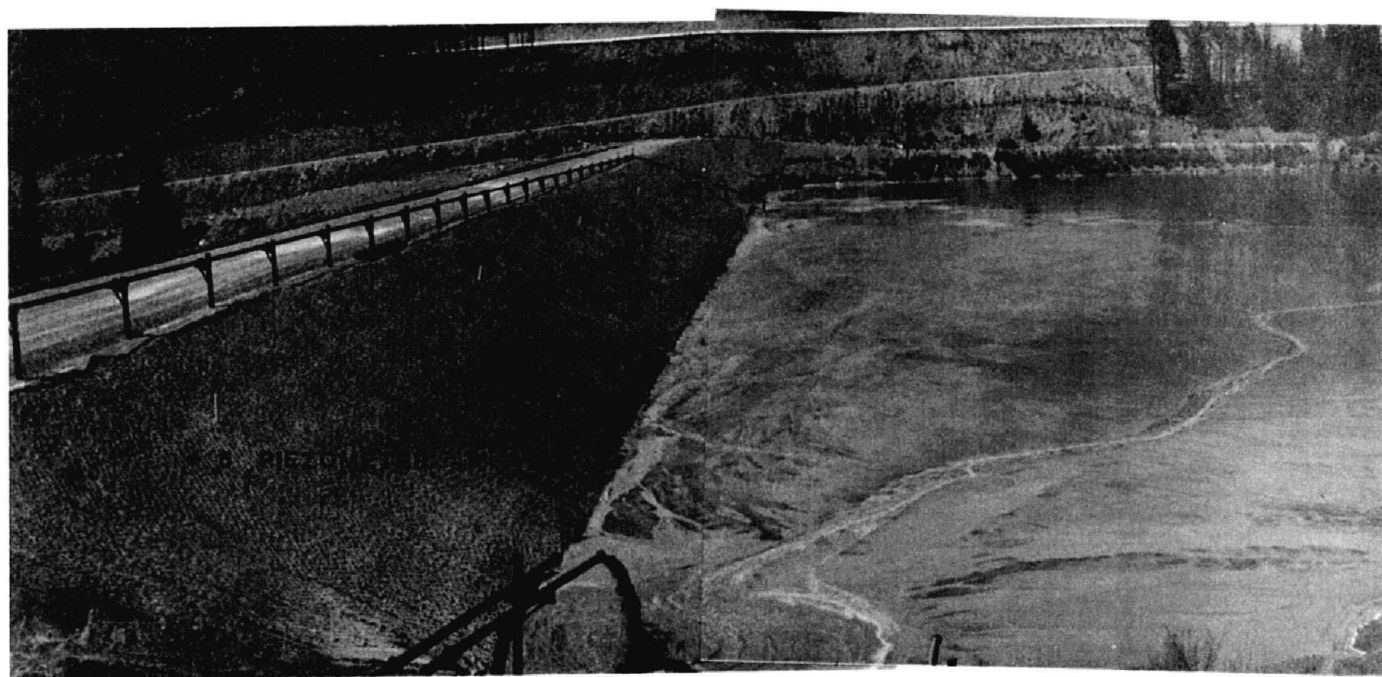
Upstream Face Looking Towards the West (8-13-81)
